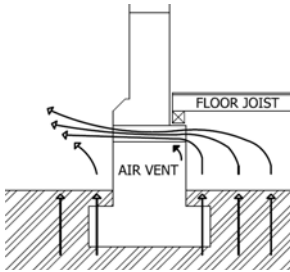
Well-ventilated underfloor space allows soil moisture to evaporate to the open air [2]
